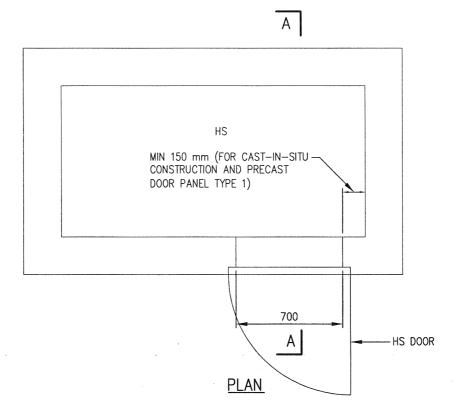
(a) CONCRETE WALL SEGMENT AT HS DOOR
